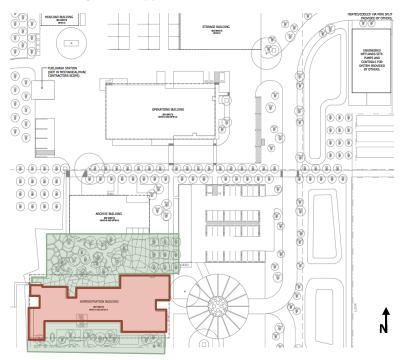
SITE PLAN COURTESY OF HGA ARCHITECTS AND ENGINEERS
